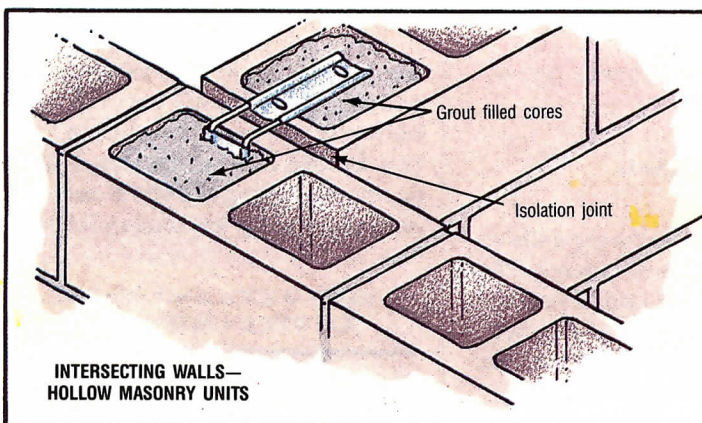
Isolation joints are installed wherever masonry abuts other building materials or wherever new masonry abuts existing masonry. The device shown here transfers transverse loads, but still lets the abutting wall elements move independently.
